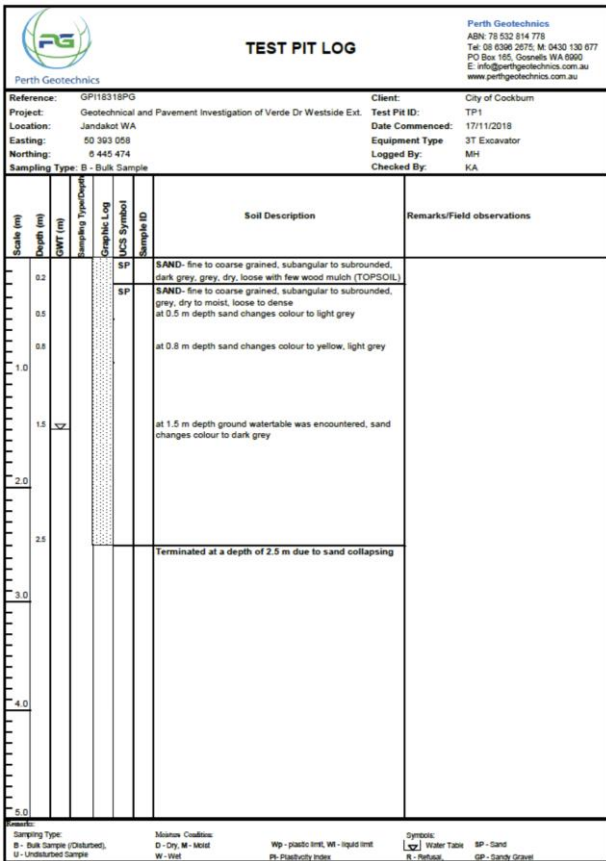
Test Pit Log (Verde Dr.) at Location TP1
